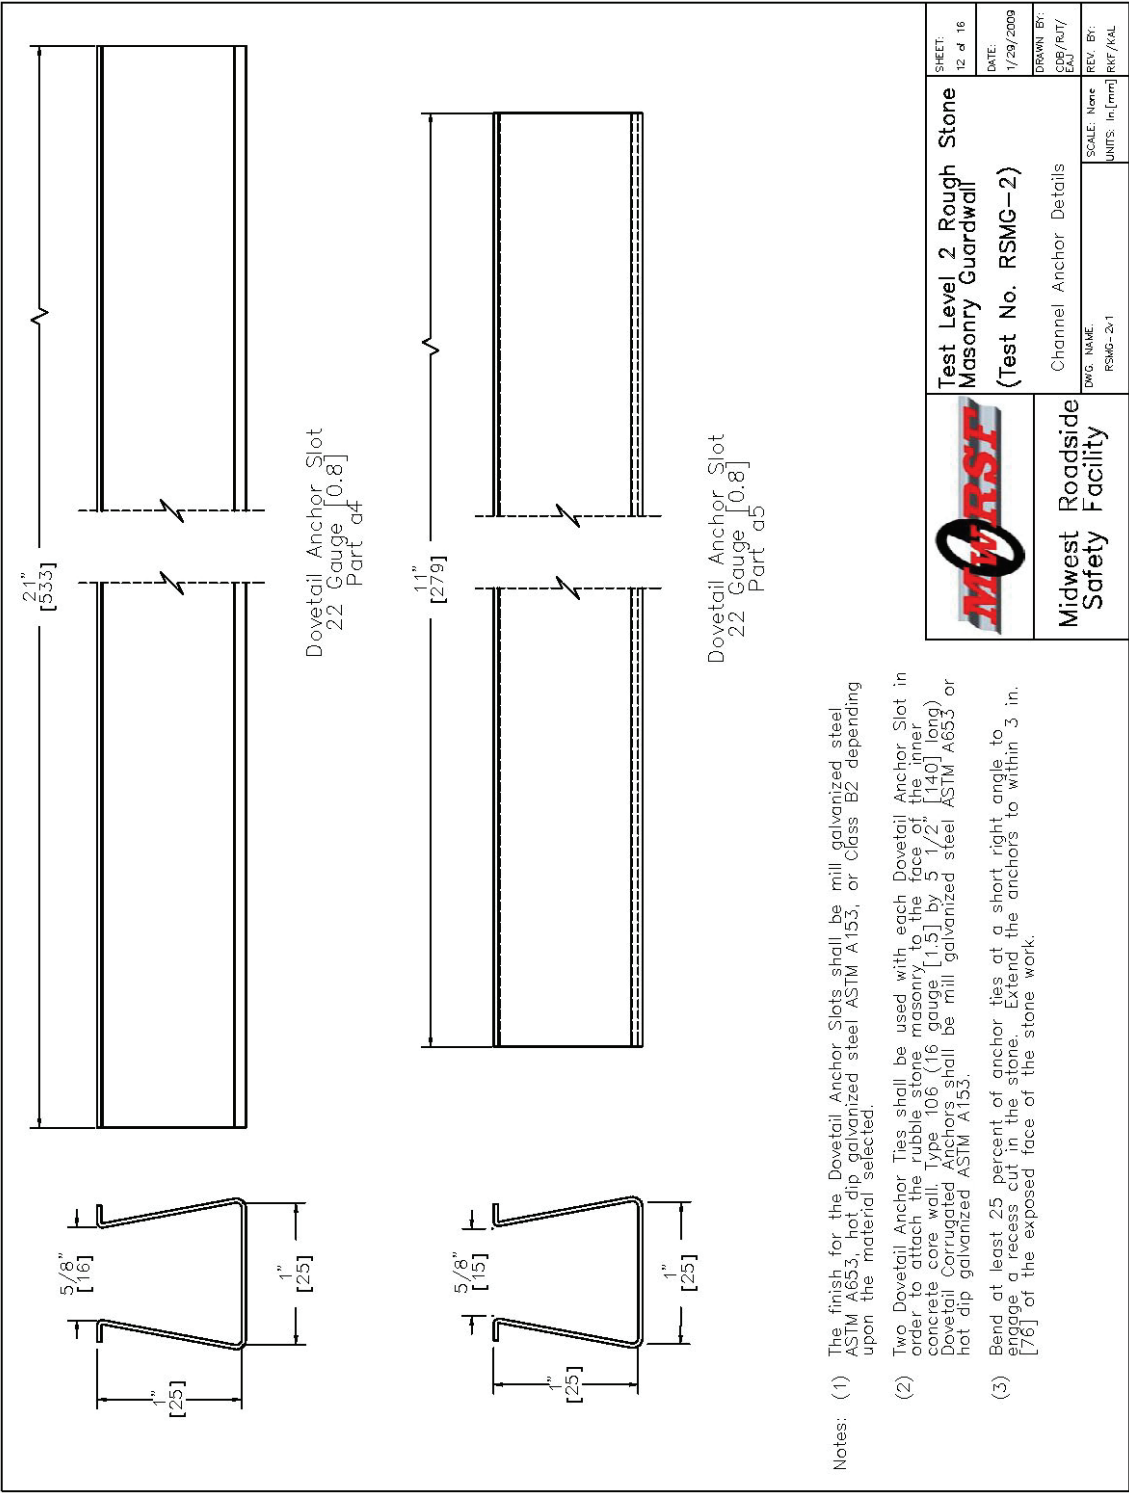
Dovetail Anchor Details, Test No. RSMG-2
